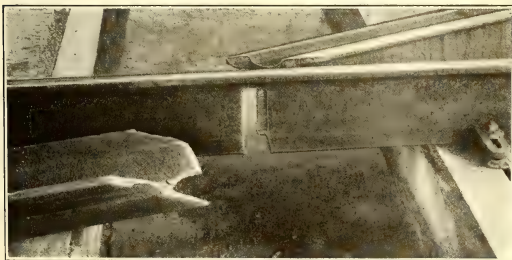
THROUGH RAIL AND ABUTTING ENDS OF ARM RAILS CUT READY FOR WELDING. FIG. 3—"JUMP" INTERSECTION WELD COMPLETE
